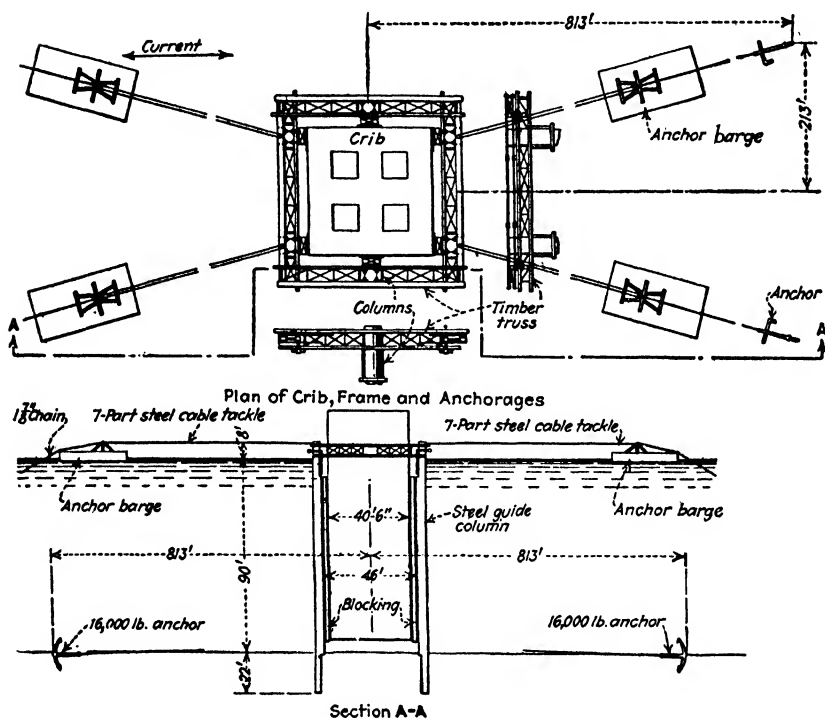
Showing Use of Ship Anchors to Guide Sinking of Caissons of Carquinez Strait Bridge.
